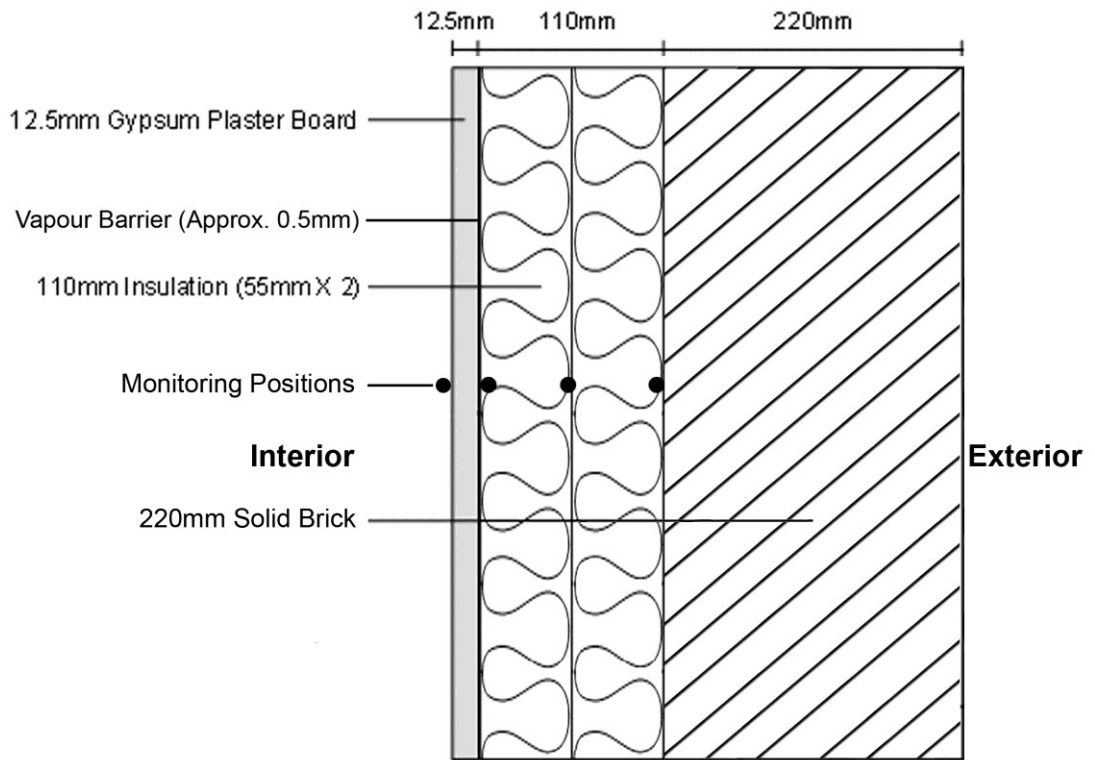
The vertical cross section of the solid brick wall assembly with vapour barrier (wall-4).
